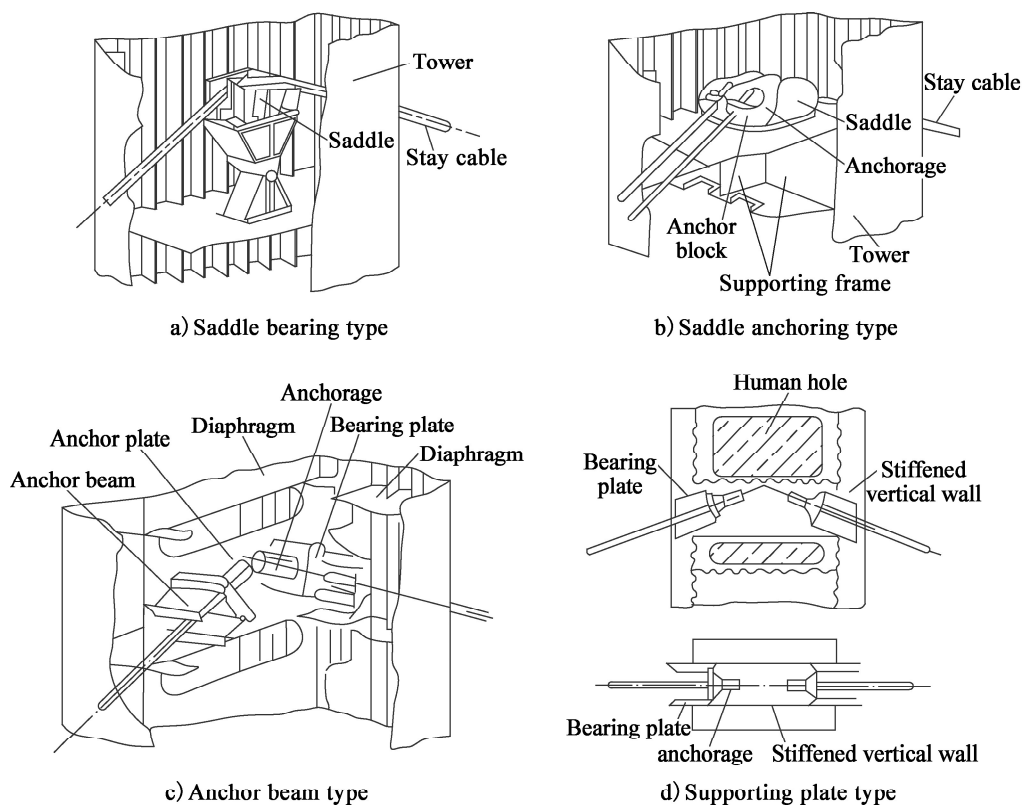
Schematic diagrams of anchorages for stay cable anchored in the steel towers
